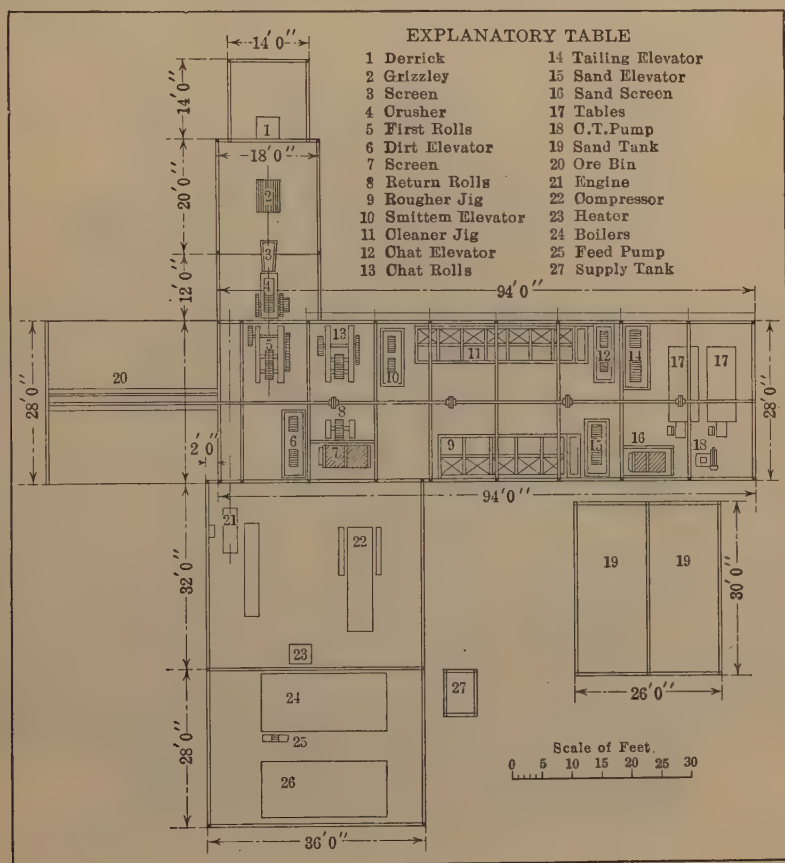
FLOOR PLAN OF BOHEMIAN GIRL MILL.
